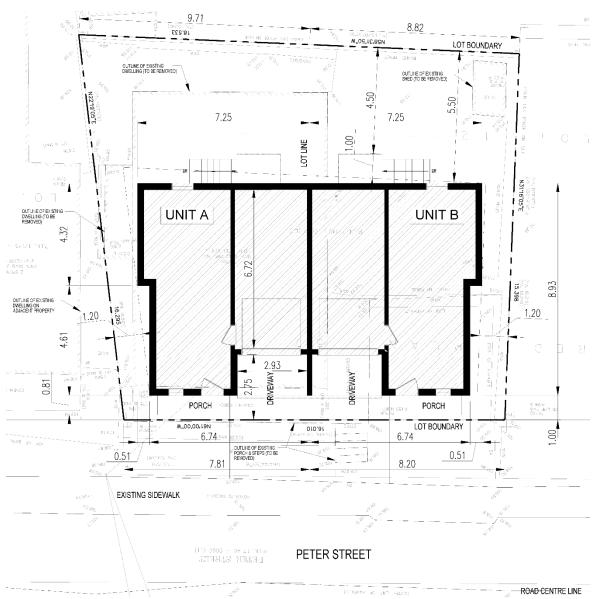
Proposed Site Plan (Source: John G. Williams Limited Architect, January 29, 2021)
